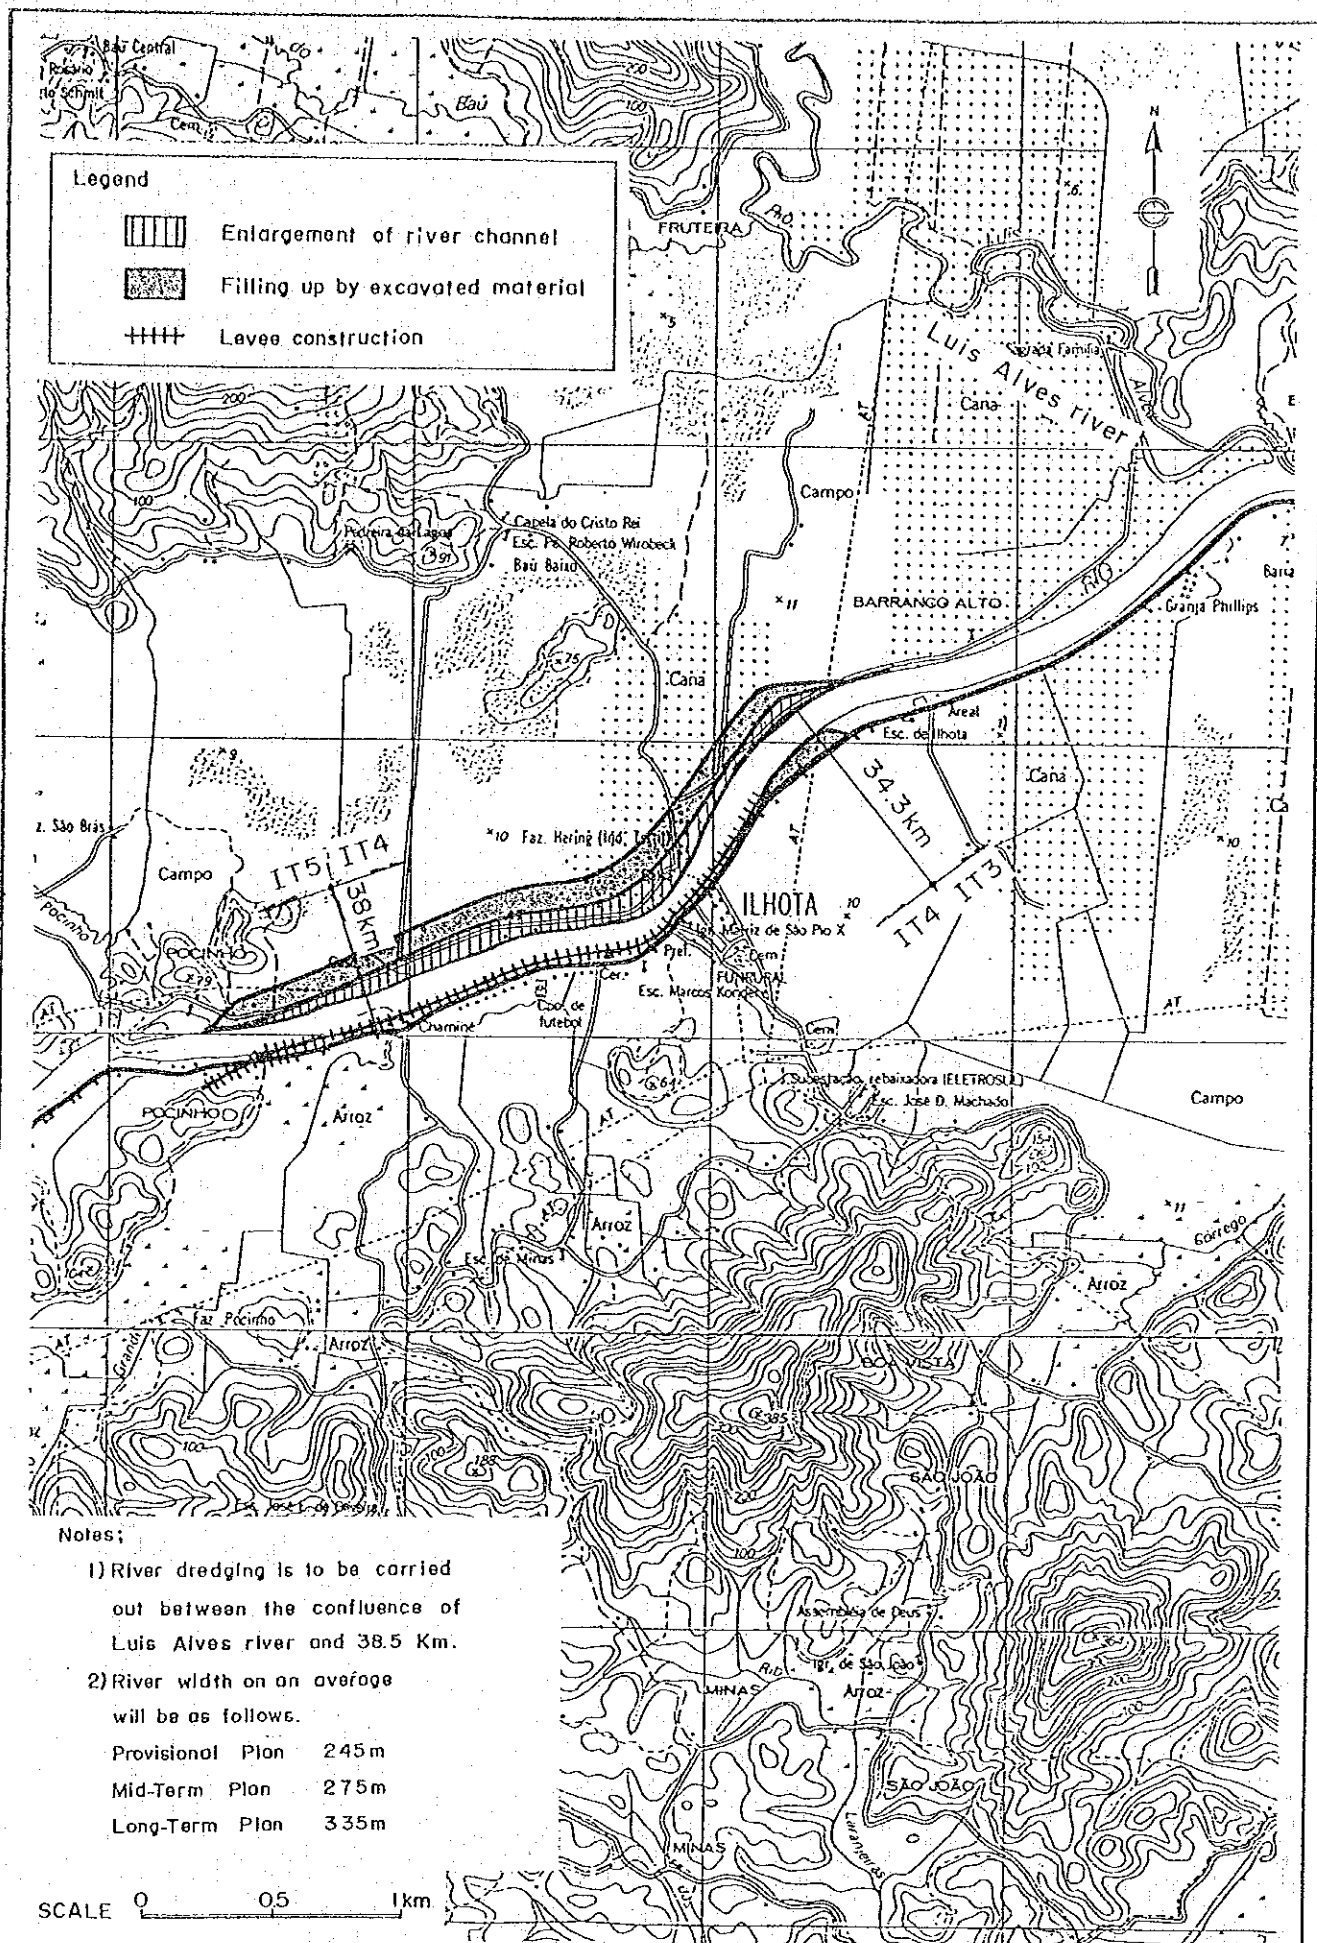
RIVER IMPROVEMENT PLAN IN ILHOTA STRETCH
